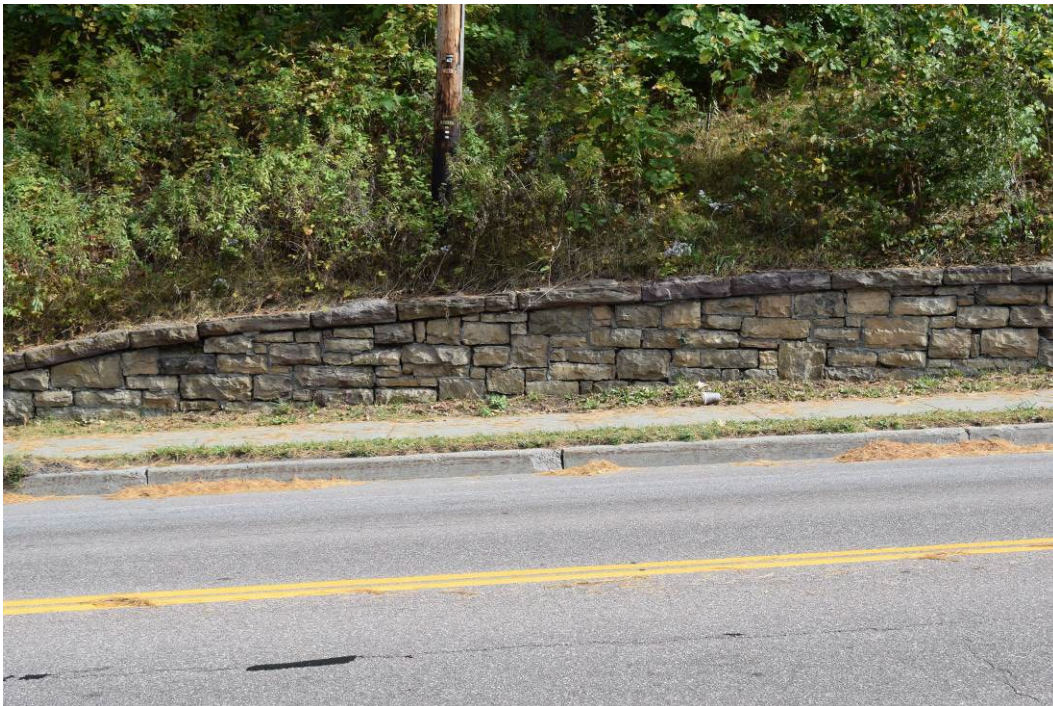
Stone wall on Colchester Avenue, near Greenmount Cemetery. Photo by VHB, October 2024.
